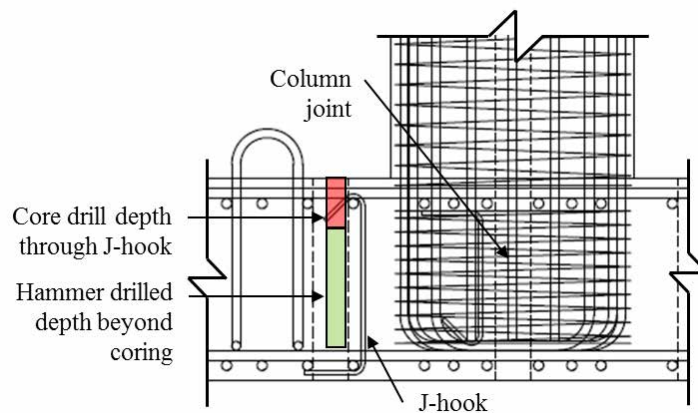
Repair bar drilling to avoid J-Hooks in specimen footing.
